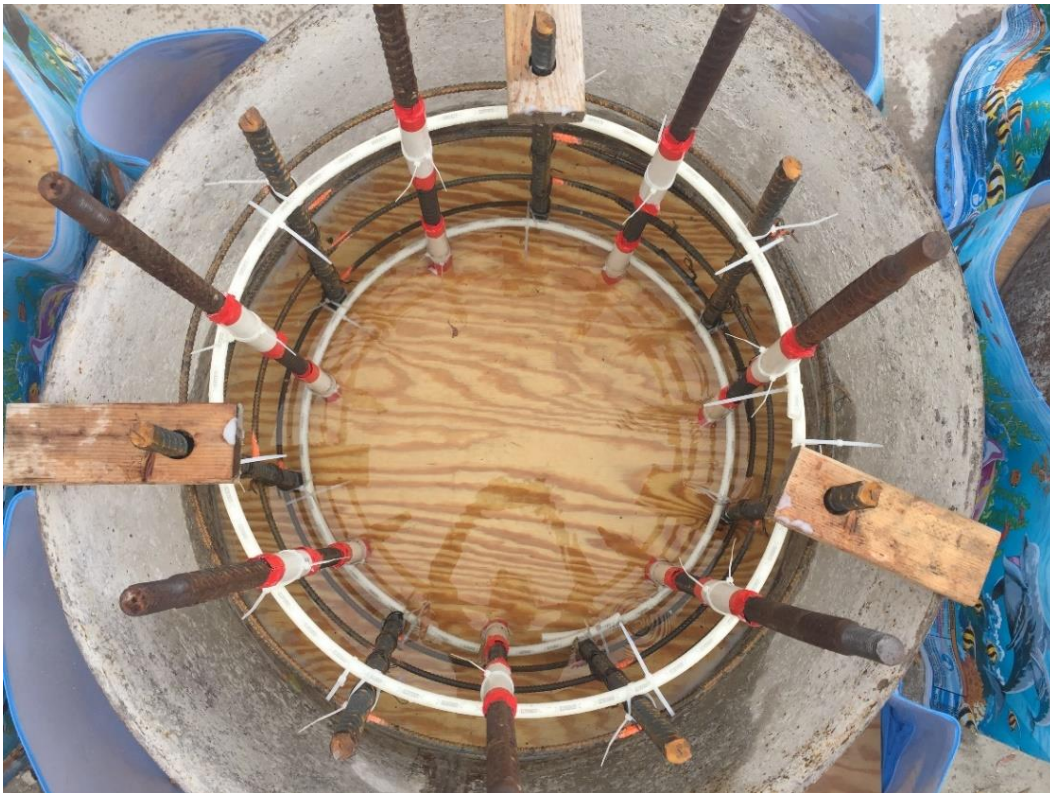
The inside of the form prior to slurry and concrete placement.
